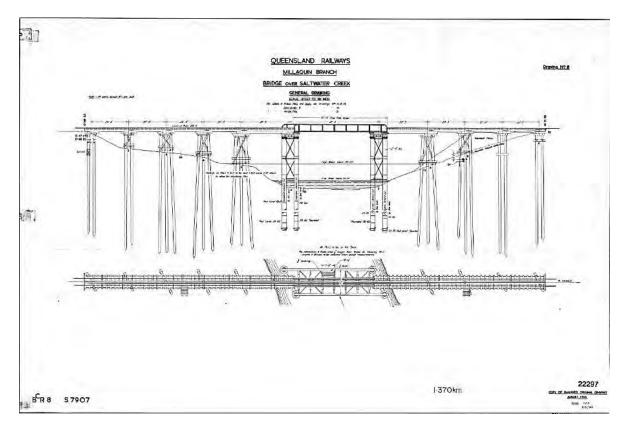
Original General Arrangement Drawing, copy of damaged original (Provided by BRC).
